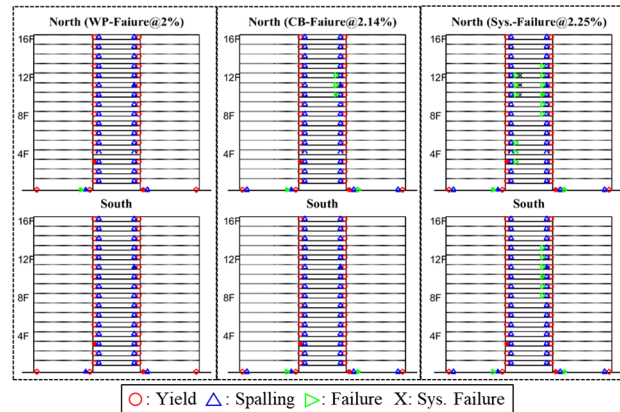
shows the damage progression for CCW50 with the roof drift. Coupling beams firstly yielded at 0.17% drift, followed by wall pier yielding at 0.40%. Coupling beams initially occurred the cover spalling at a drift of 0.75%. The maximum base shear is 7135 kN at a drift of 1.75% after the cover spalling of all coupling beams.
